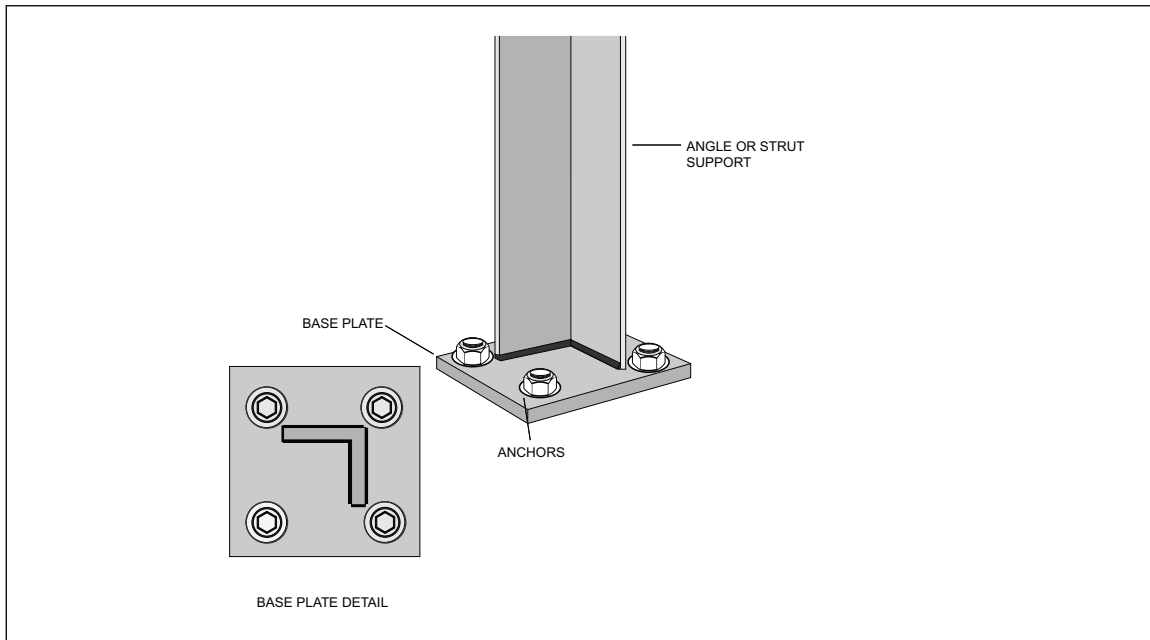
G. Example of other equipment anchored to structural floor using base plate (Figure 81 from FEMA 412)
